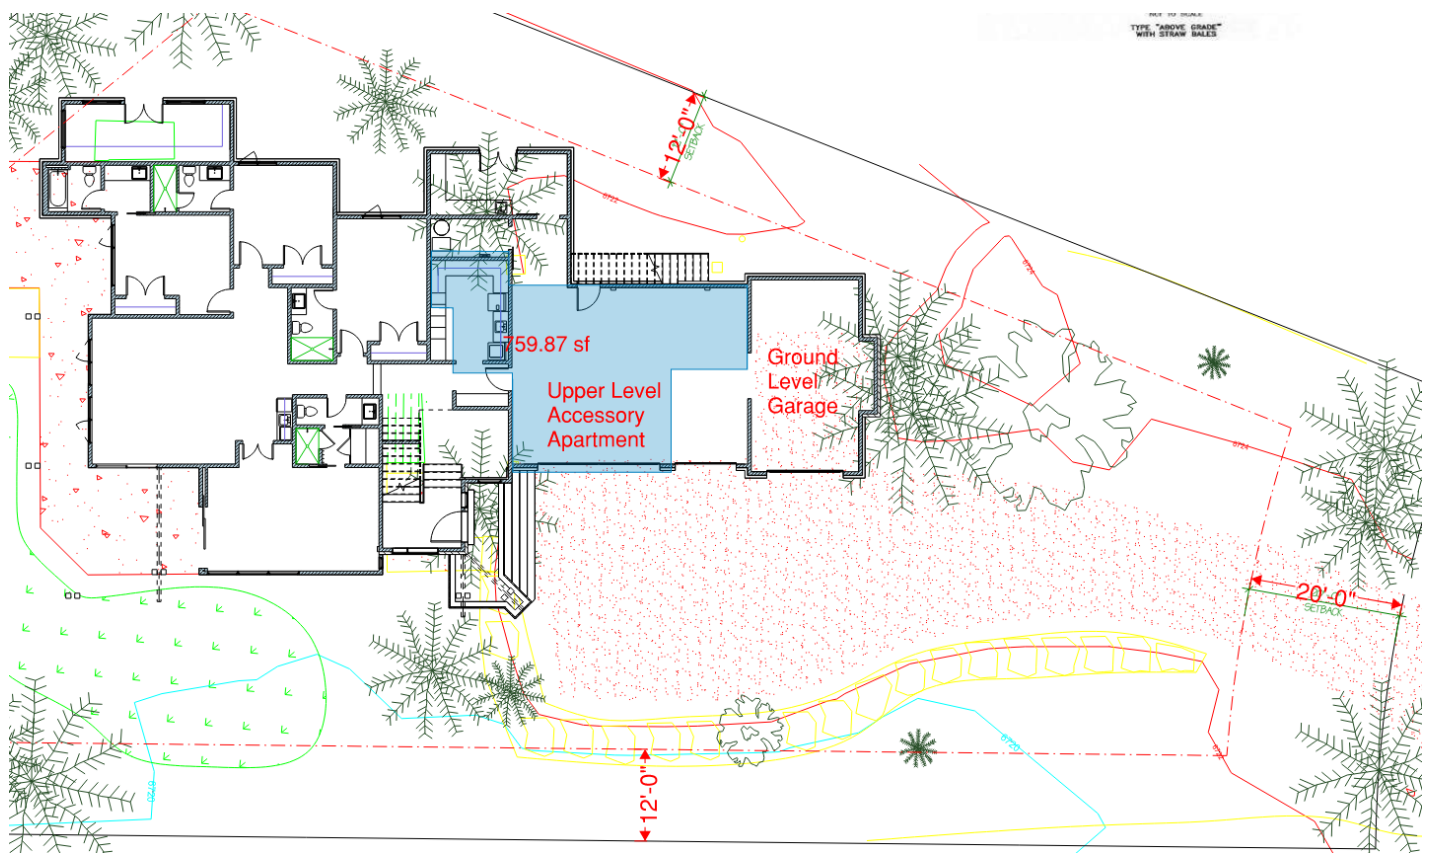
Site Plan showing the new footprint of the SFD with the upper-level Accessory Apartment overlaid in blue
